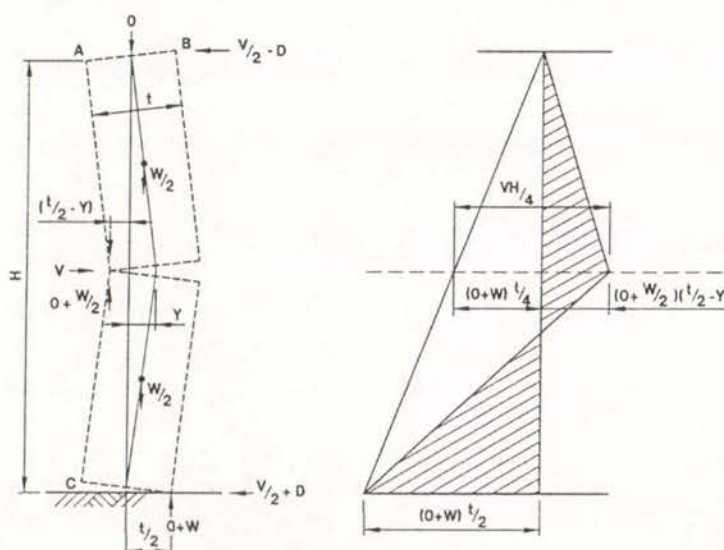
Behaviour of face loaded wall under static loading - a) forces assumed to act on the wall and - b) wall bending moment distribution.
